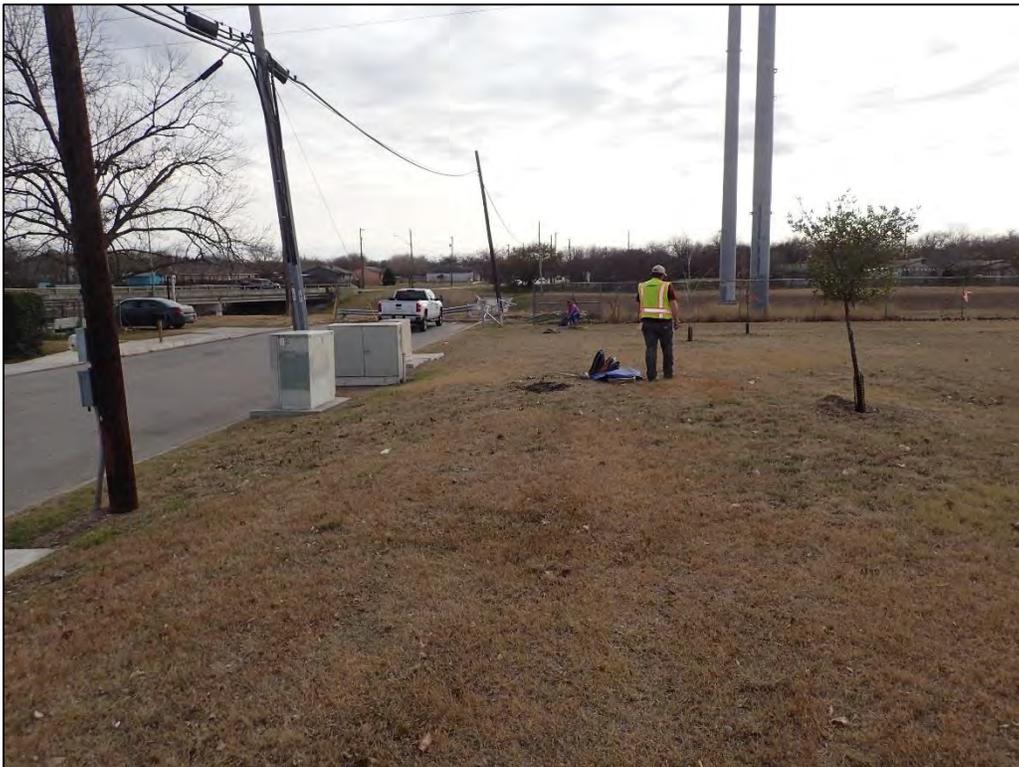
Proposed parking area in southeast corner of Alderete Park, looking southwest.
